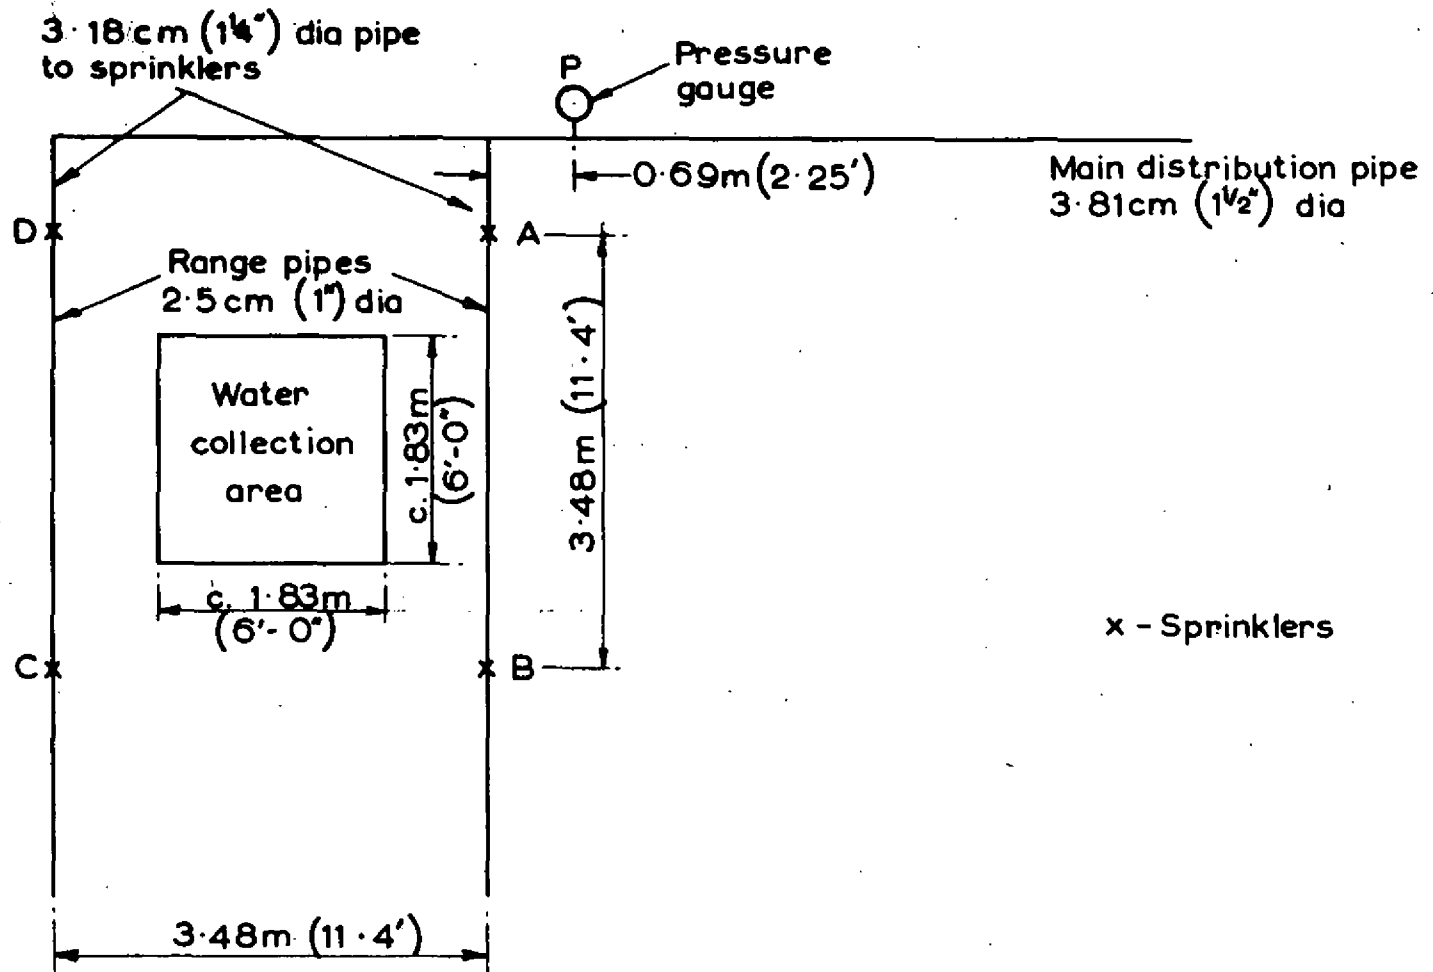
ARRANGEMENT OF SPRINKLER PIPEWORK
